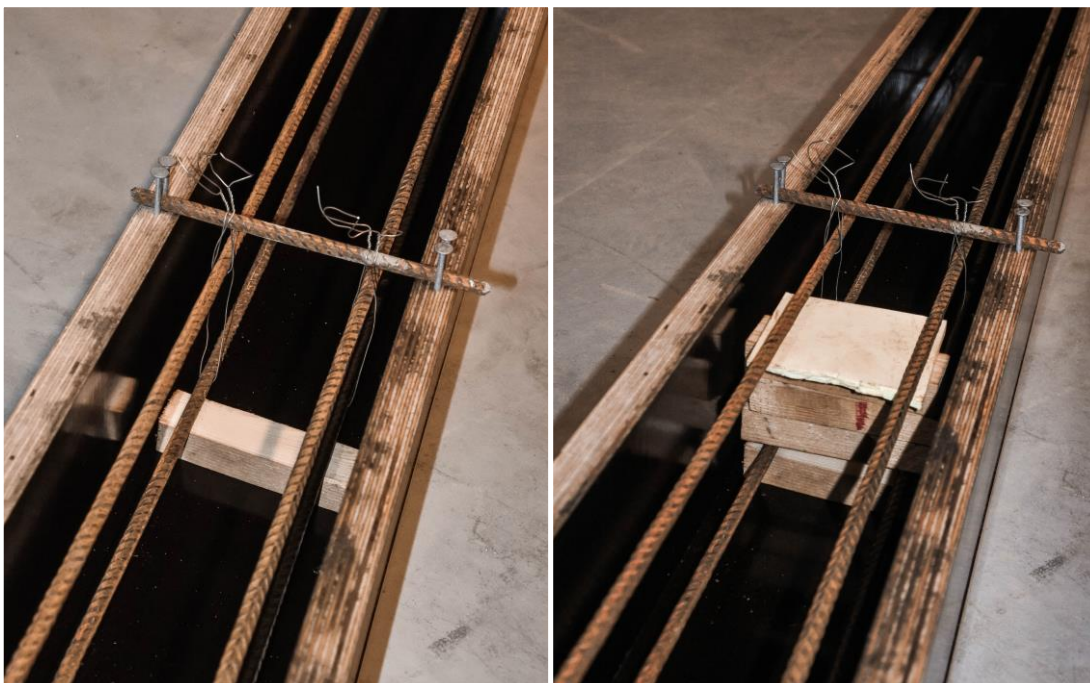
Procedure for hanging the reinforcement bars in steel wires, a) for bottom reinforcement, b) for top reinforcement.
